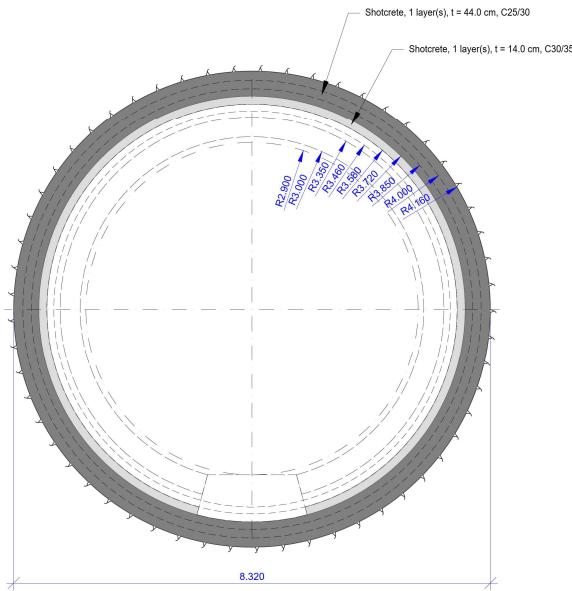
Cross section output on drawing – Shotcrete with invert tubing only in shotcrete SCT2
